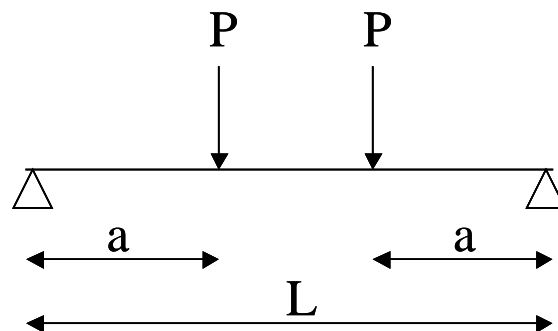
Setup of the Stuttgart Test used to test the beam B1, [4].
